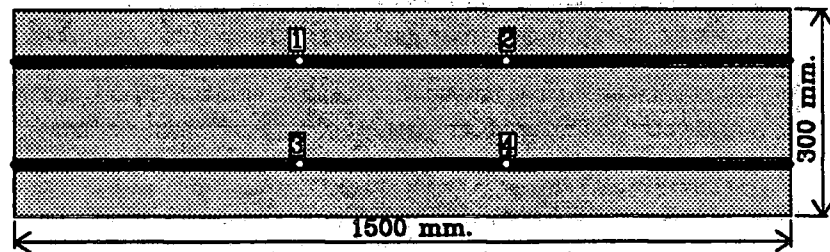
Cross-sectional schedule of a typical Phenolic Concrete bridge deck panel.
